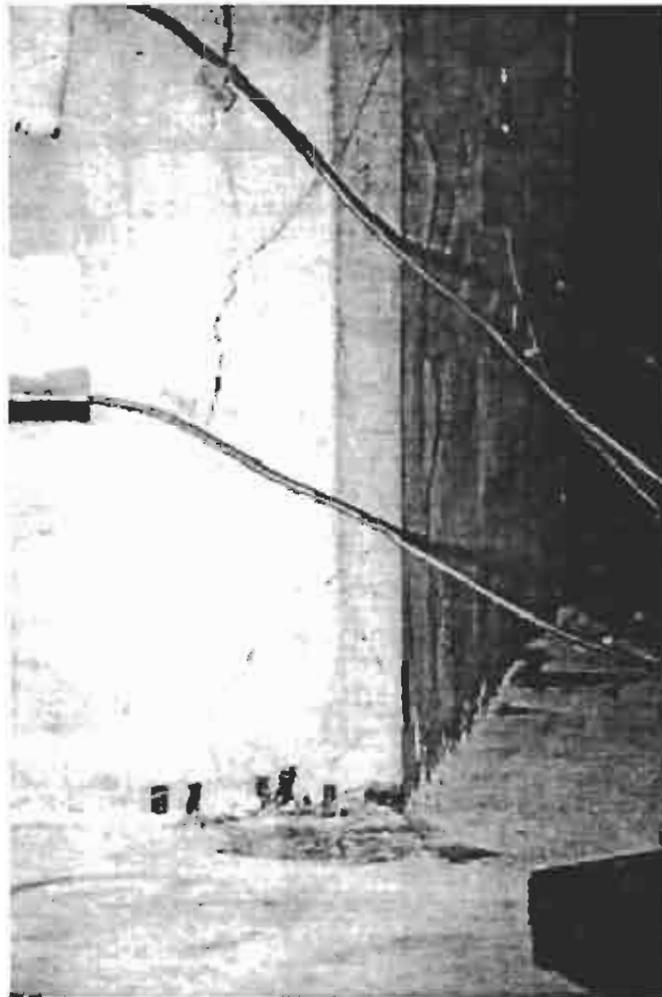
Failure of As-built Lap Splice Enhancement Rectangular Column
